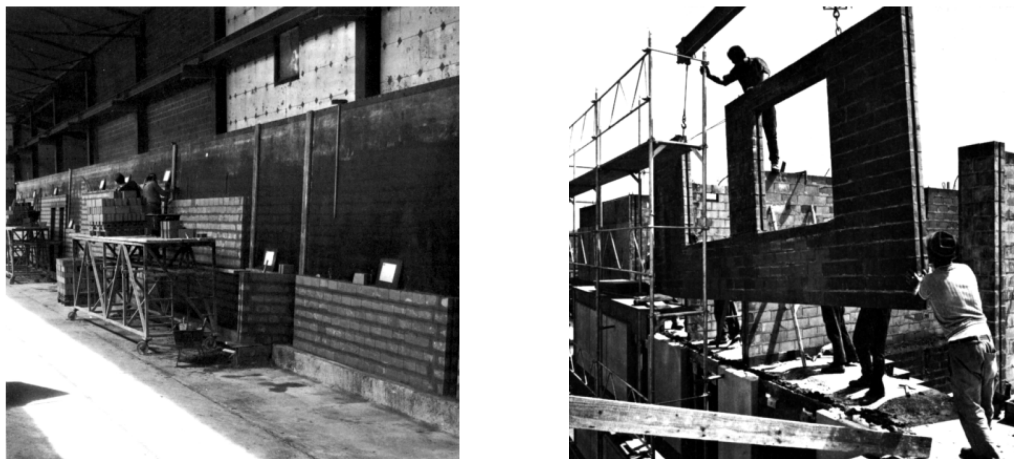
Prefabricating brickwork panels following the “Preton” process developed in the 1960s: (left) manual prefabrication process; (right) fitting of prefabricated brickwork panels on site.
